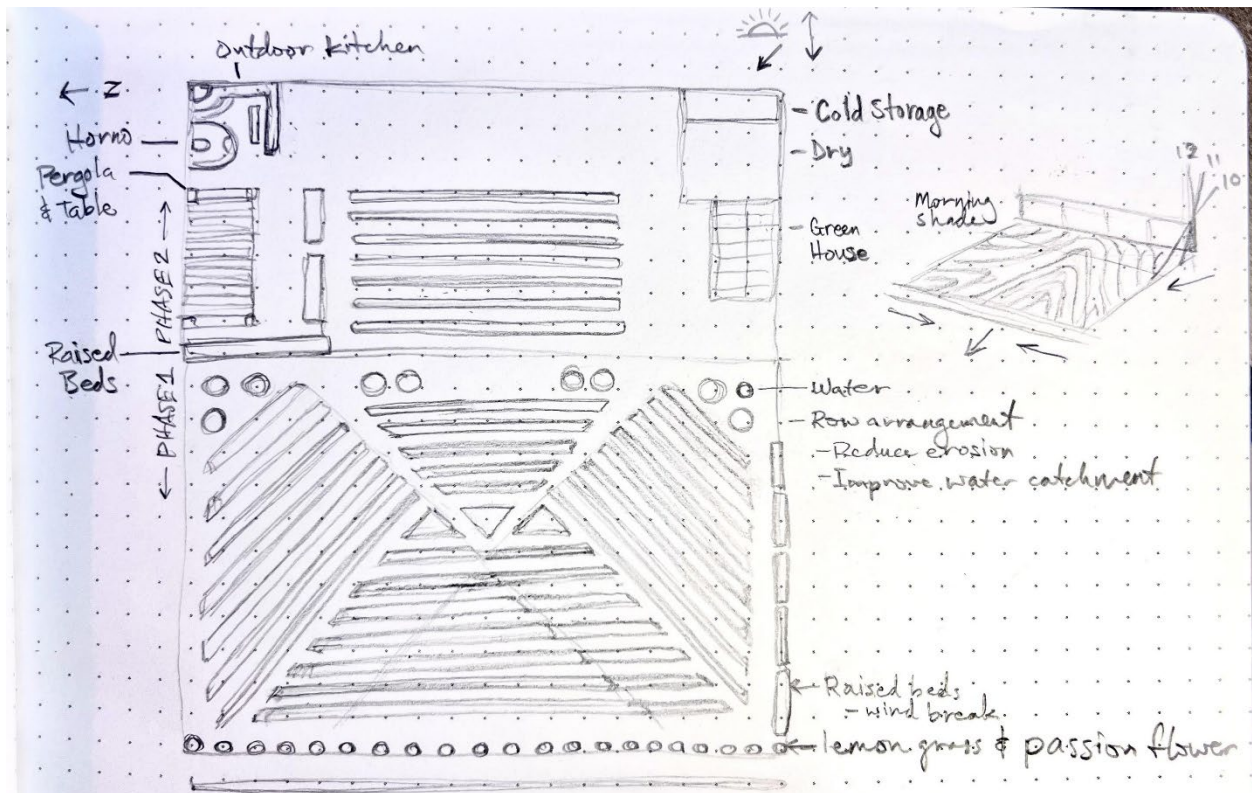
Applicant drawing depicting site plan of proposed community garden. Phase 1 is identified as the lower-half of the drawing; Phase 2 involves the design and construction of semi-permanent structures.
